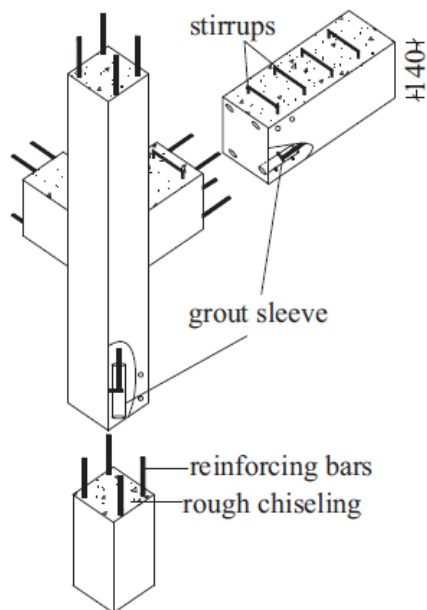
Detail of connections of the elements, column-to-column and beam-to-column, [Ref.: 040]
